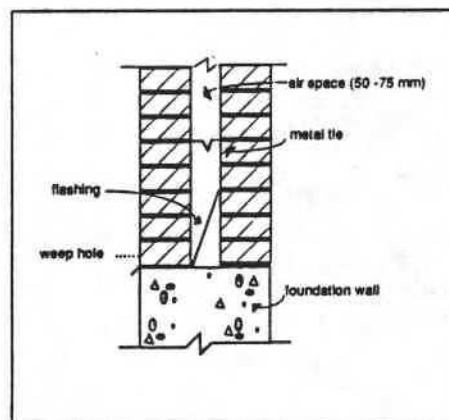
Masonry cavity wall section, as designed 25 years ago
